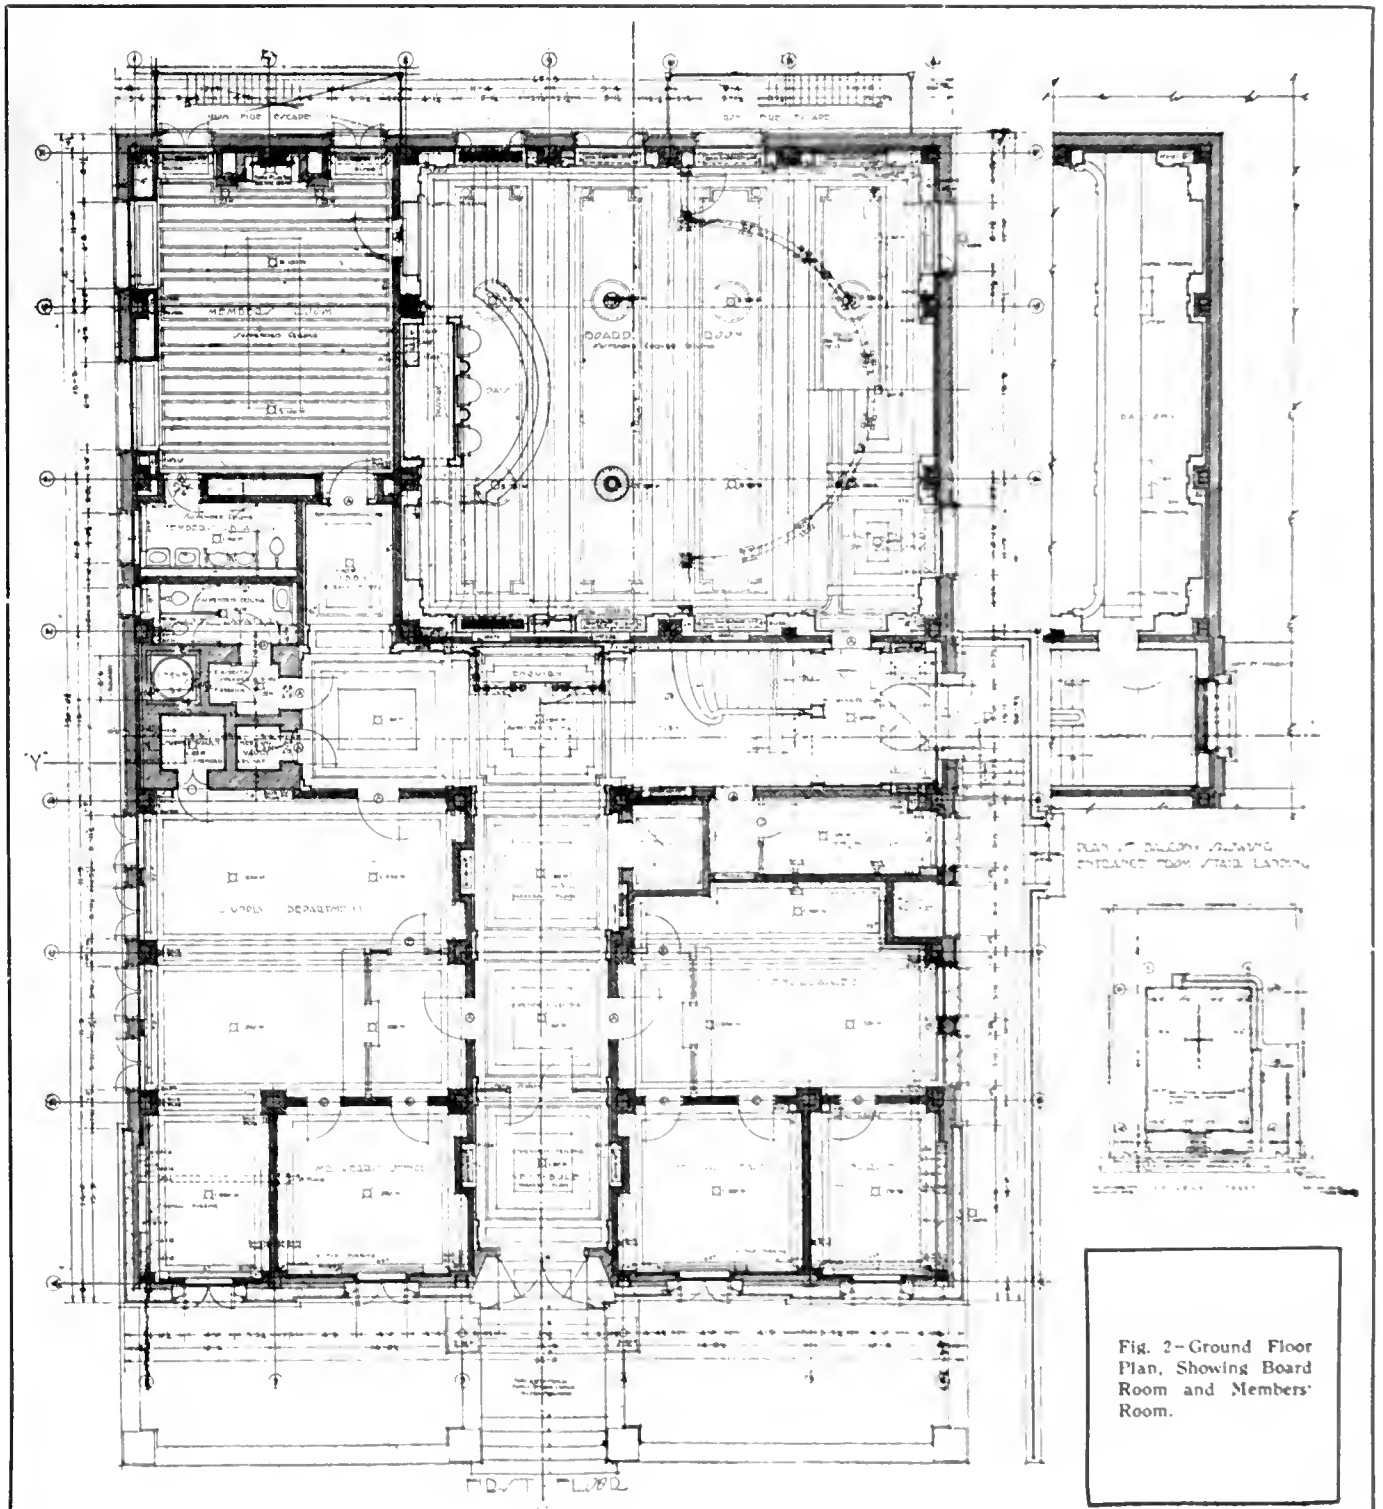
Ground Floor Plan, Showing Board Room and Members' Room.
